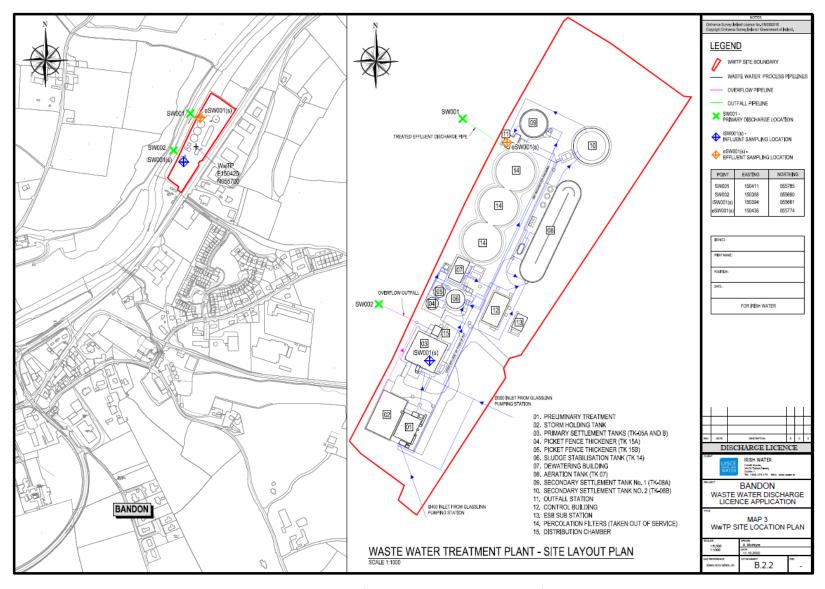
Bandon Waste Water Treatment Plant Layout
